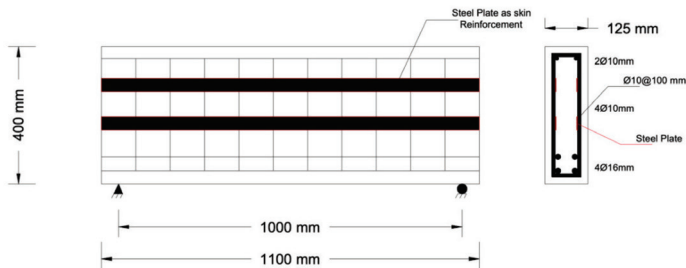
Details of self-compacting concrete deep beam with steel plate as skin reinforcement
